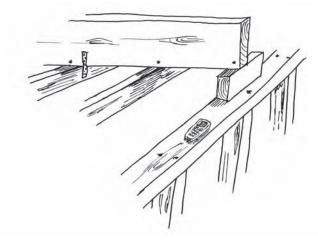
Installation of a supporting block between the hanger and the top of the wall
